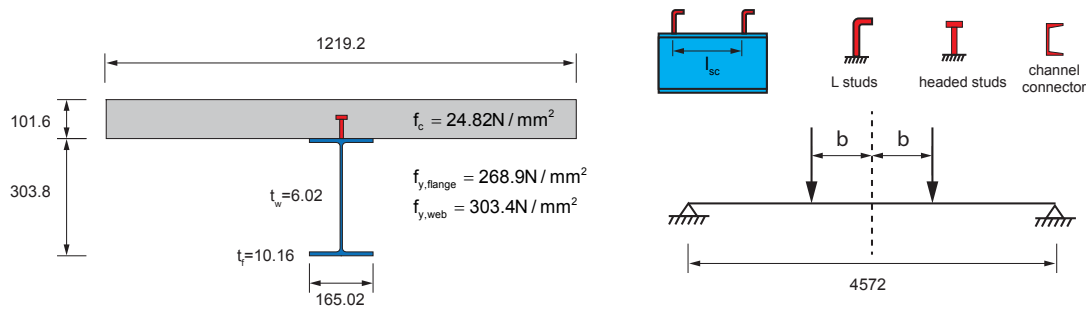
The cross-section and loads position of test in [14] (units are transferred to mm)
